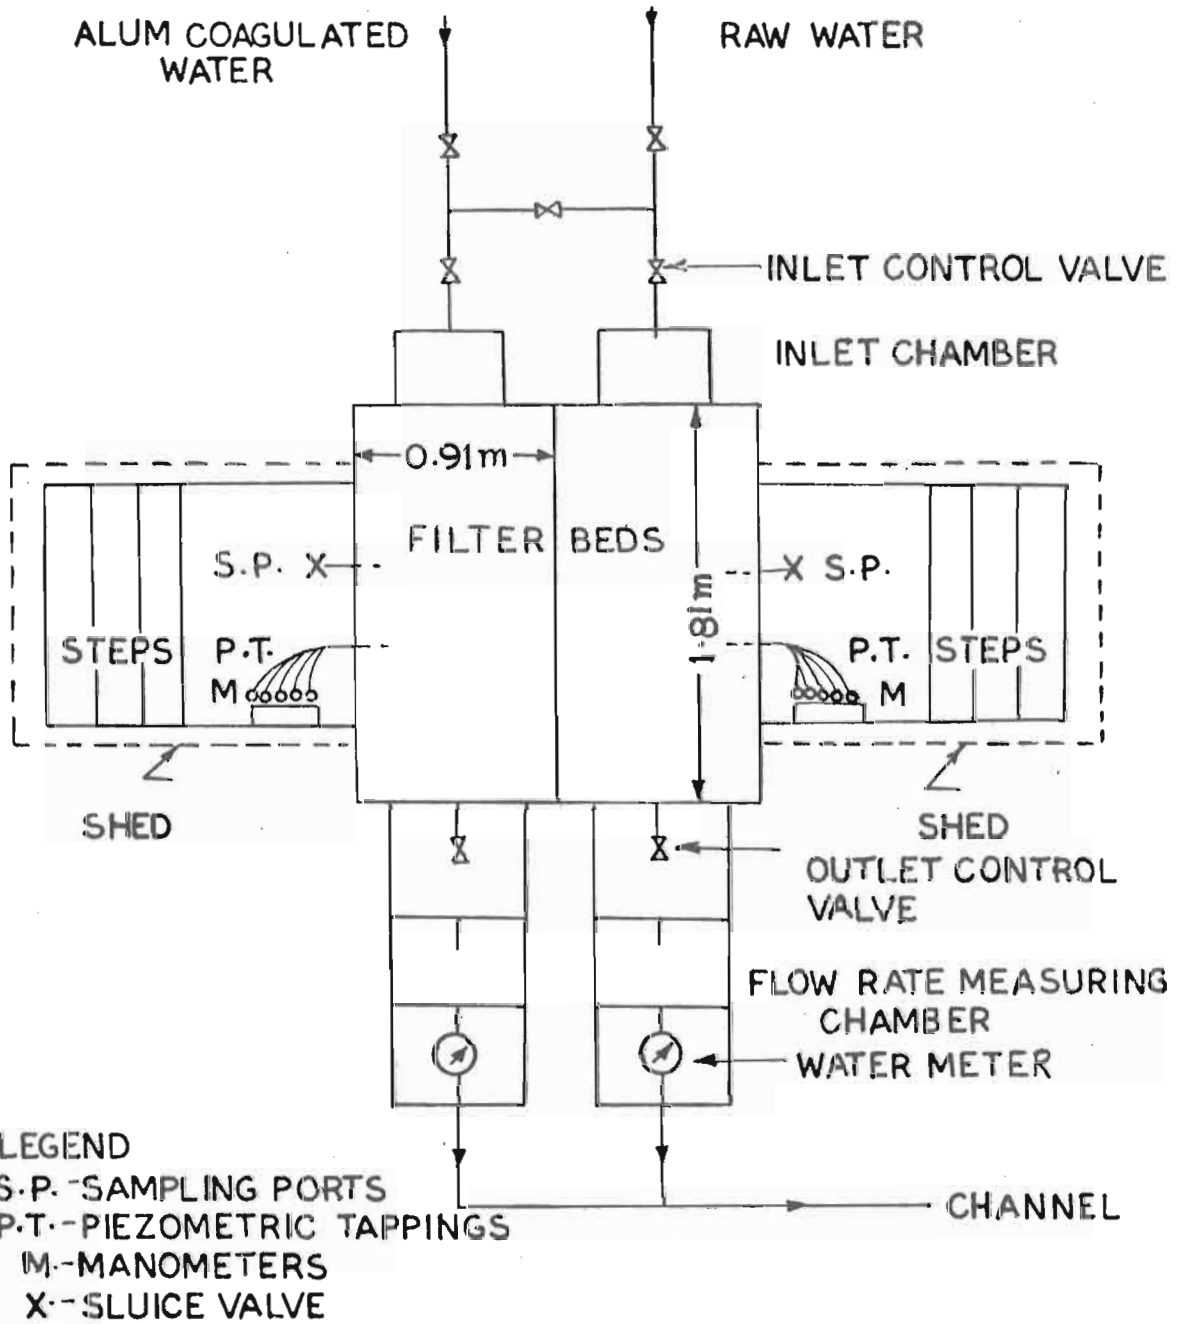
LAYOUT PLAN OF PILOT-SCALE FILTERS
